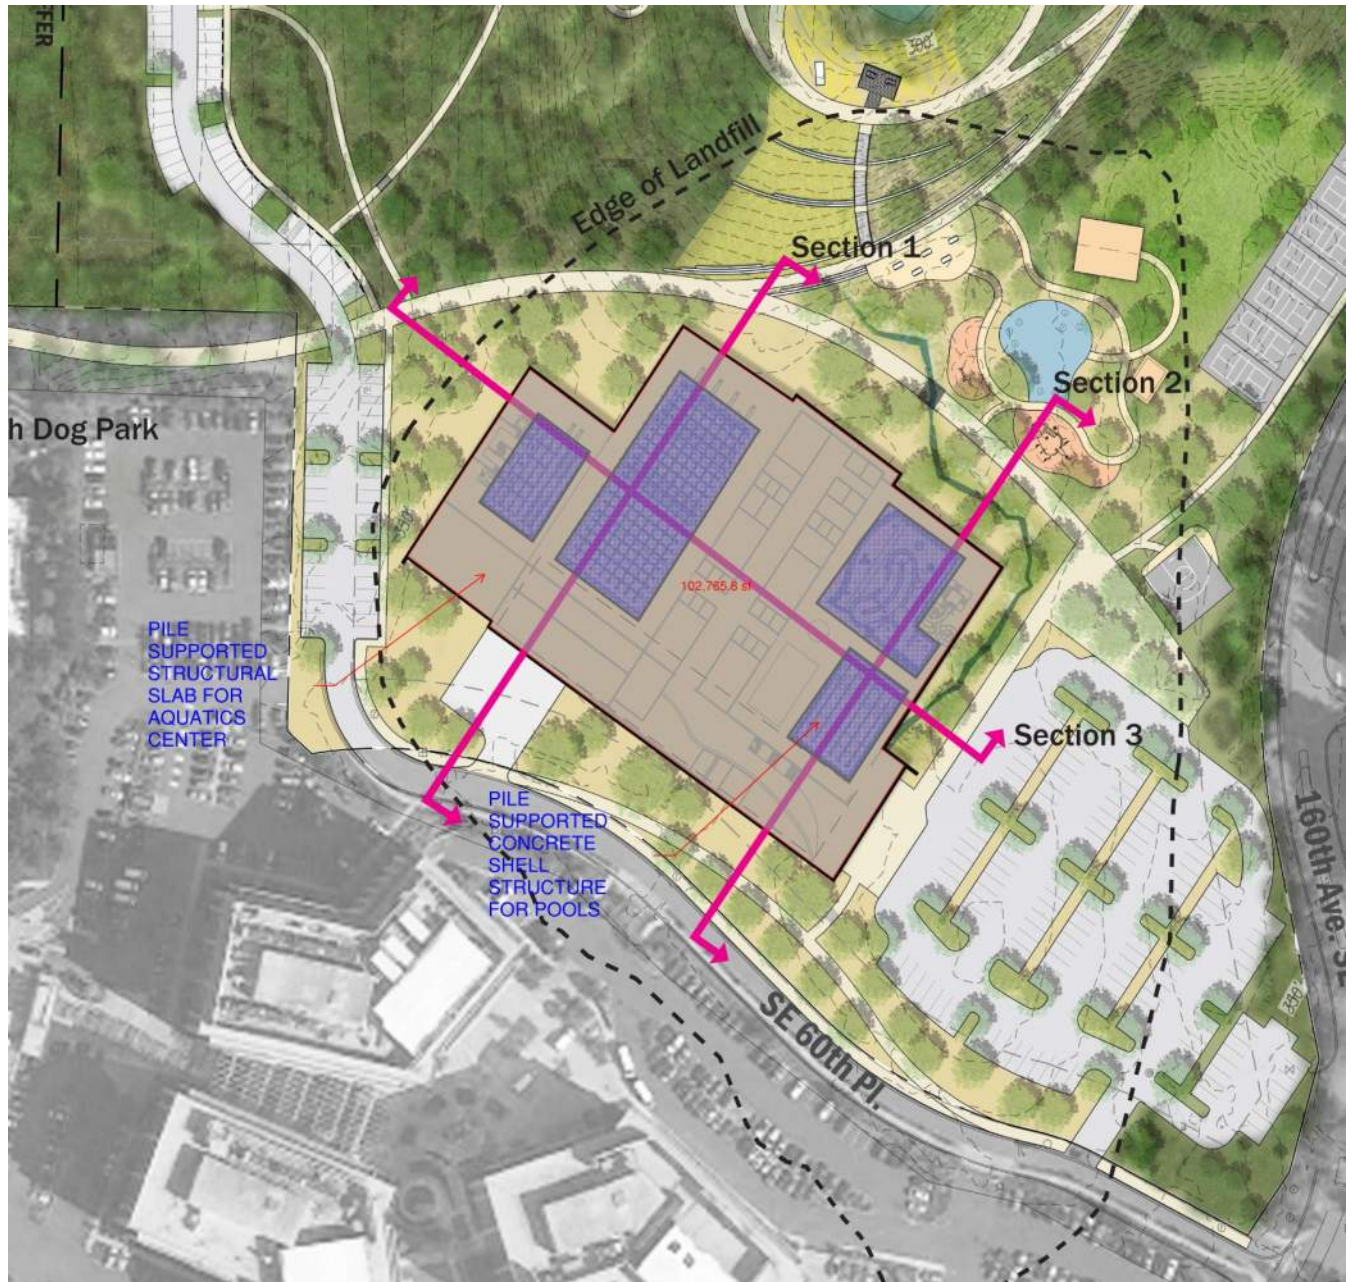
AQUATIC CENTER OVERALL PLAN – CONCEPT #2
